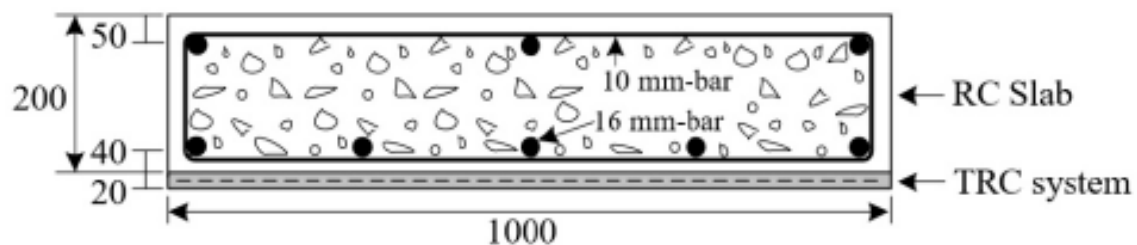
Cross-section of a full-Scale Slab Specimen Strengthened with TRC system. (Kim, You, Ryu, Ahn, & Koh, 2021)
